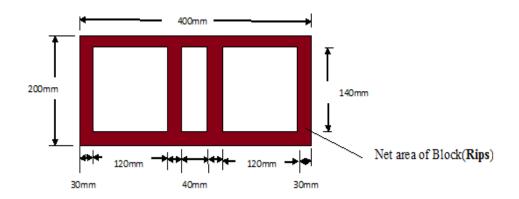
Plan of hollow concrete Blocks explain the net area
